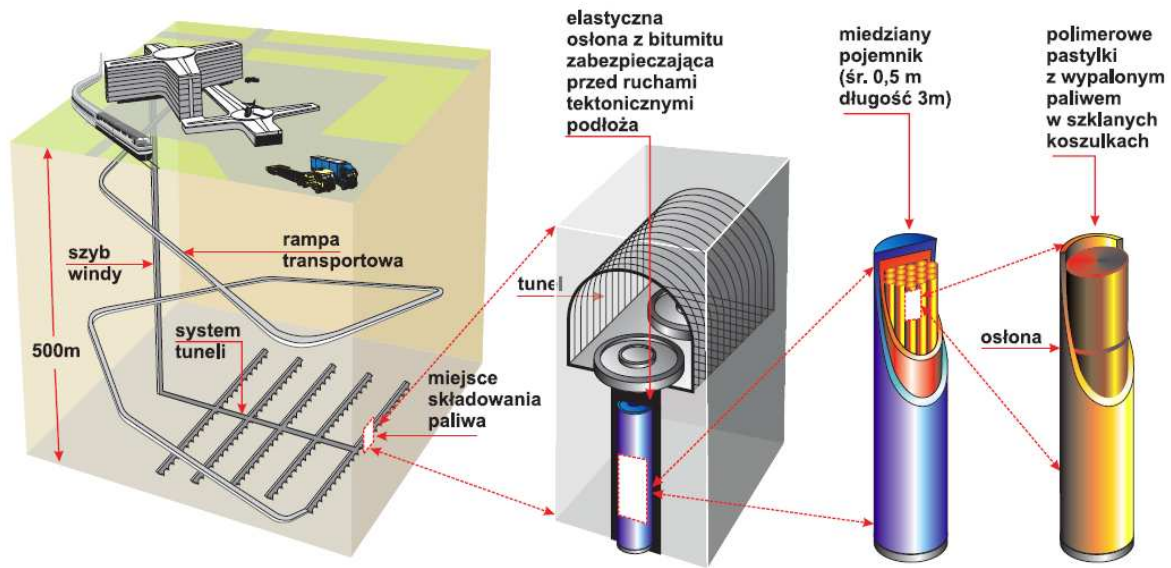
System of barriers protecting spent fuel in underground storage ¹⁸⁹.
